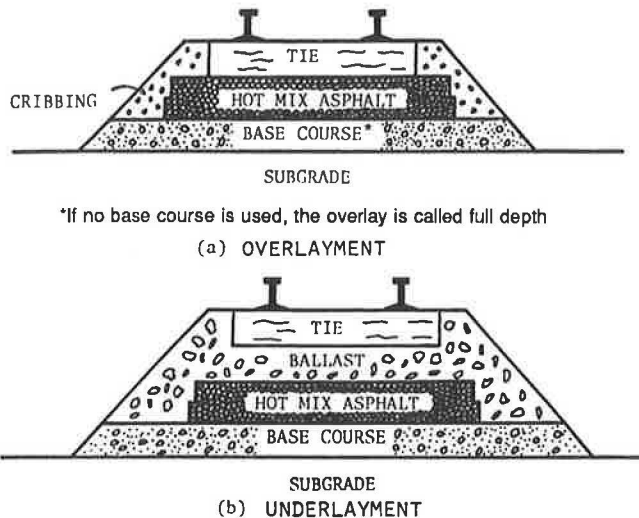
Typical cross sections of hot-mix asphalt trackbeds.
